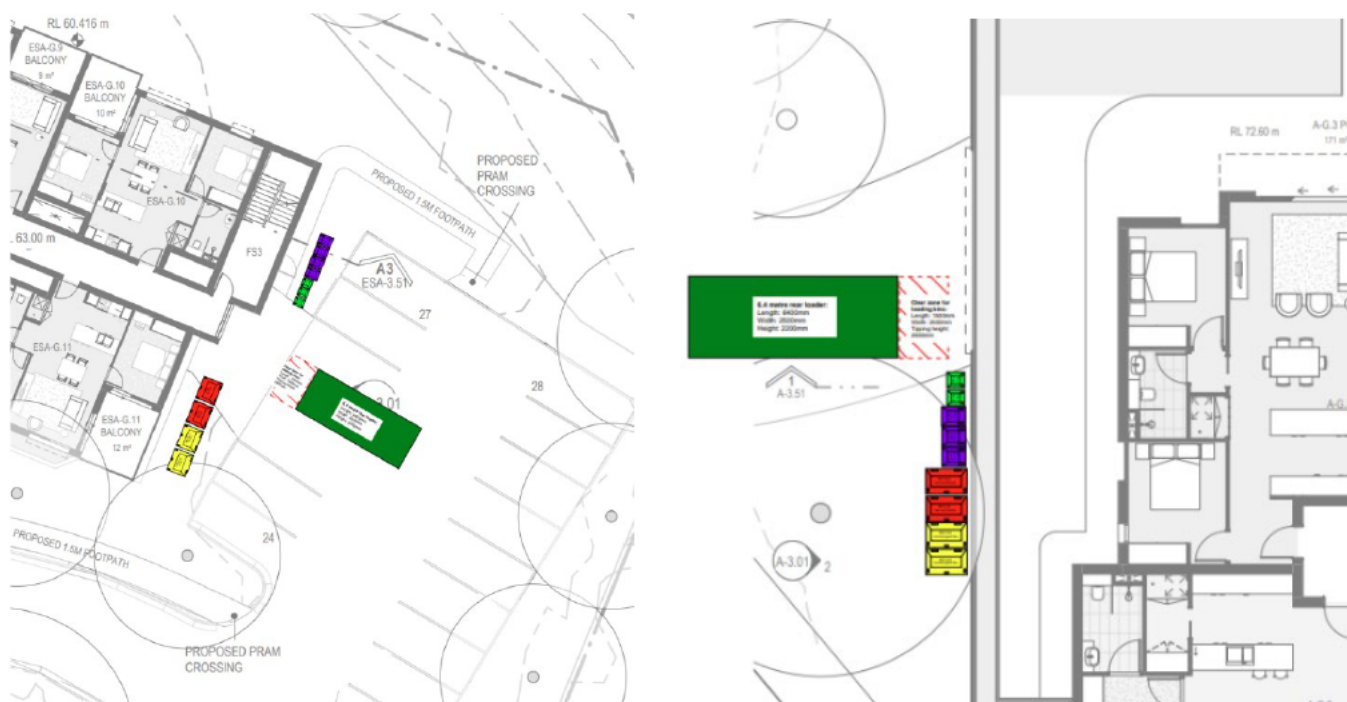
Excerpts from waste storage and collection diagrams demonstrating inappropriate proposed propping locations which block basement access for ESA Apartments and Building A's waste collection (Source: Waste Management Plan, prepared by Ratio).
